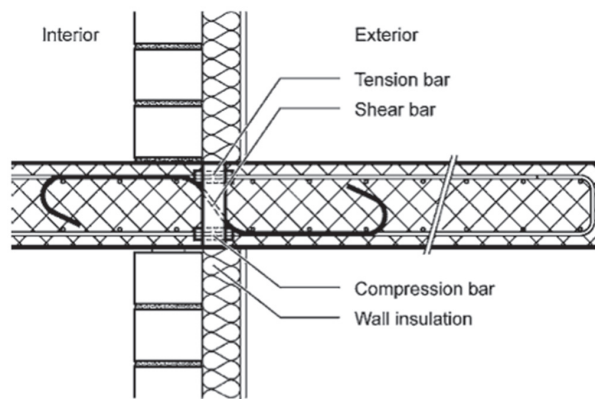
Typical thermal break with steel bars currently used for balcony connections¹⁵.
